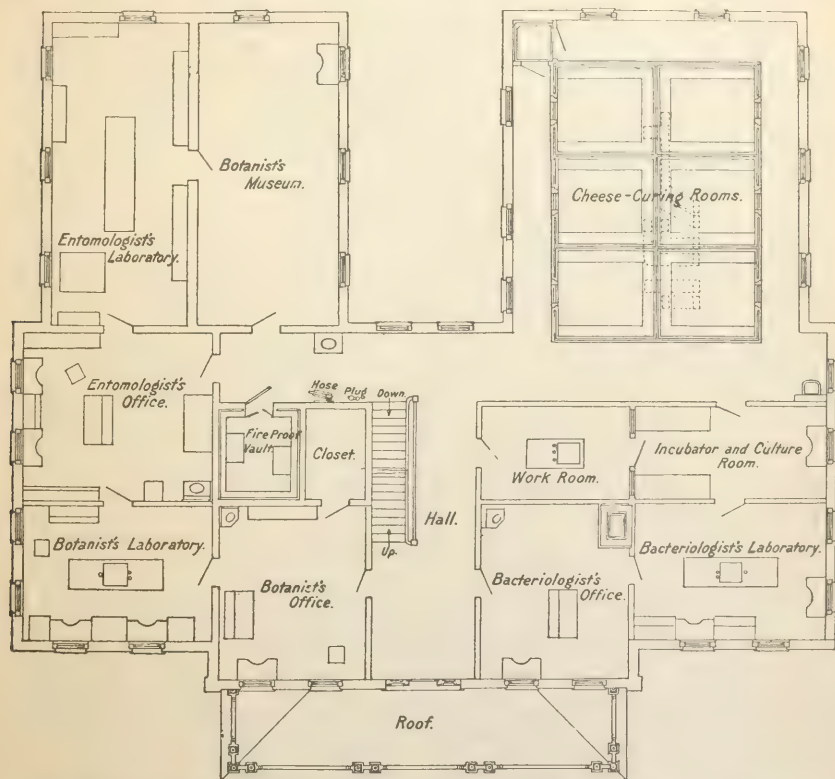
Second floor plan of Biological and Dairy Building, New York State Experiment Station.
